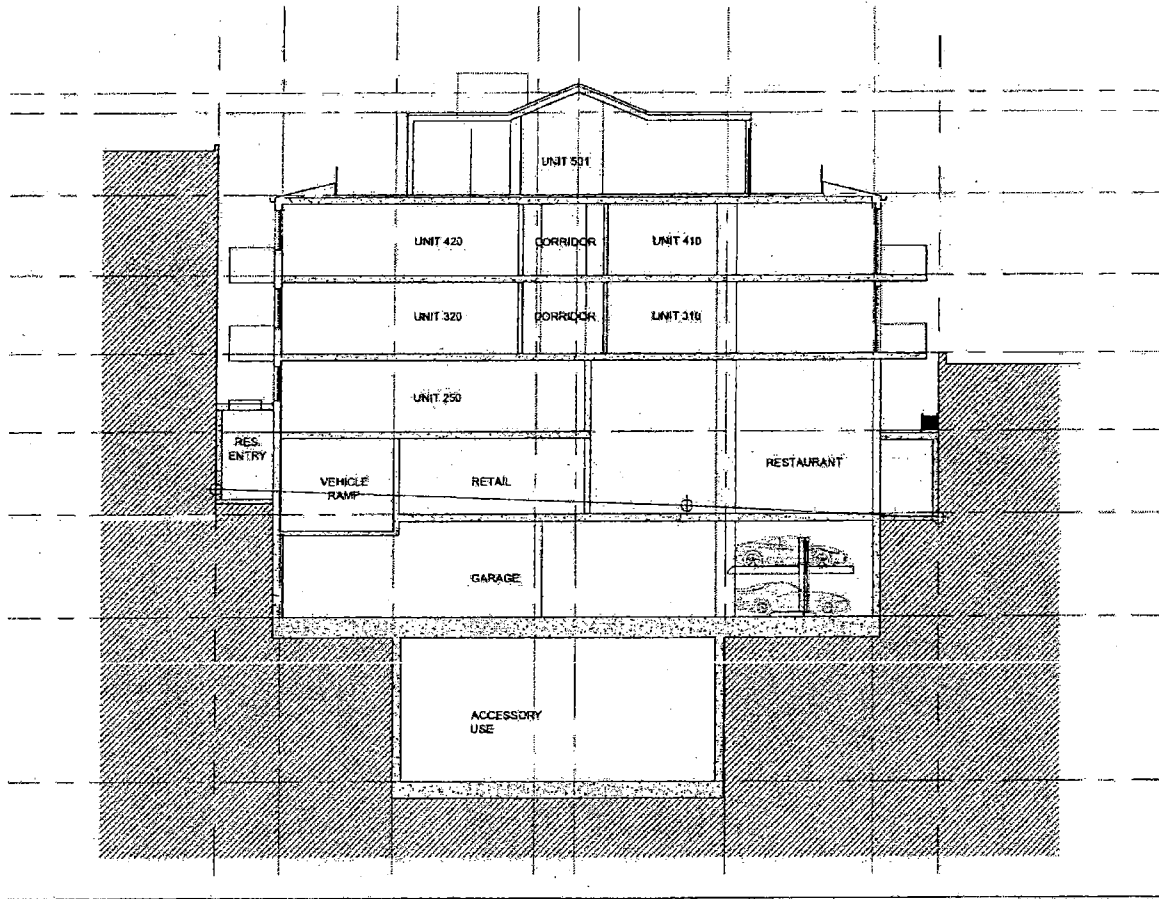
PROPOSED 1731 POWELL ST NORTH-SOUTH SECTION
